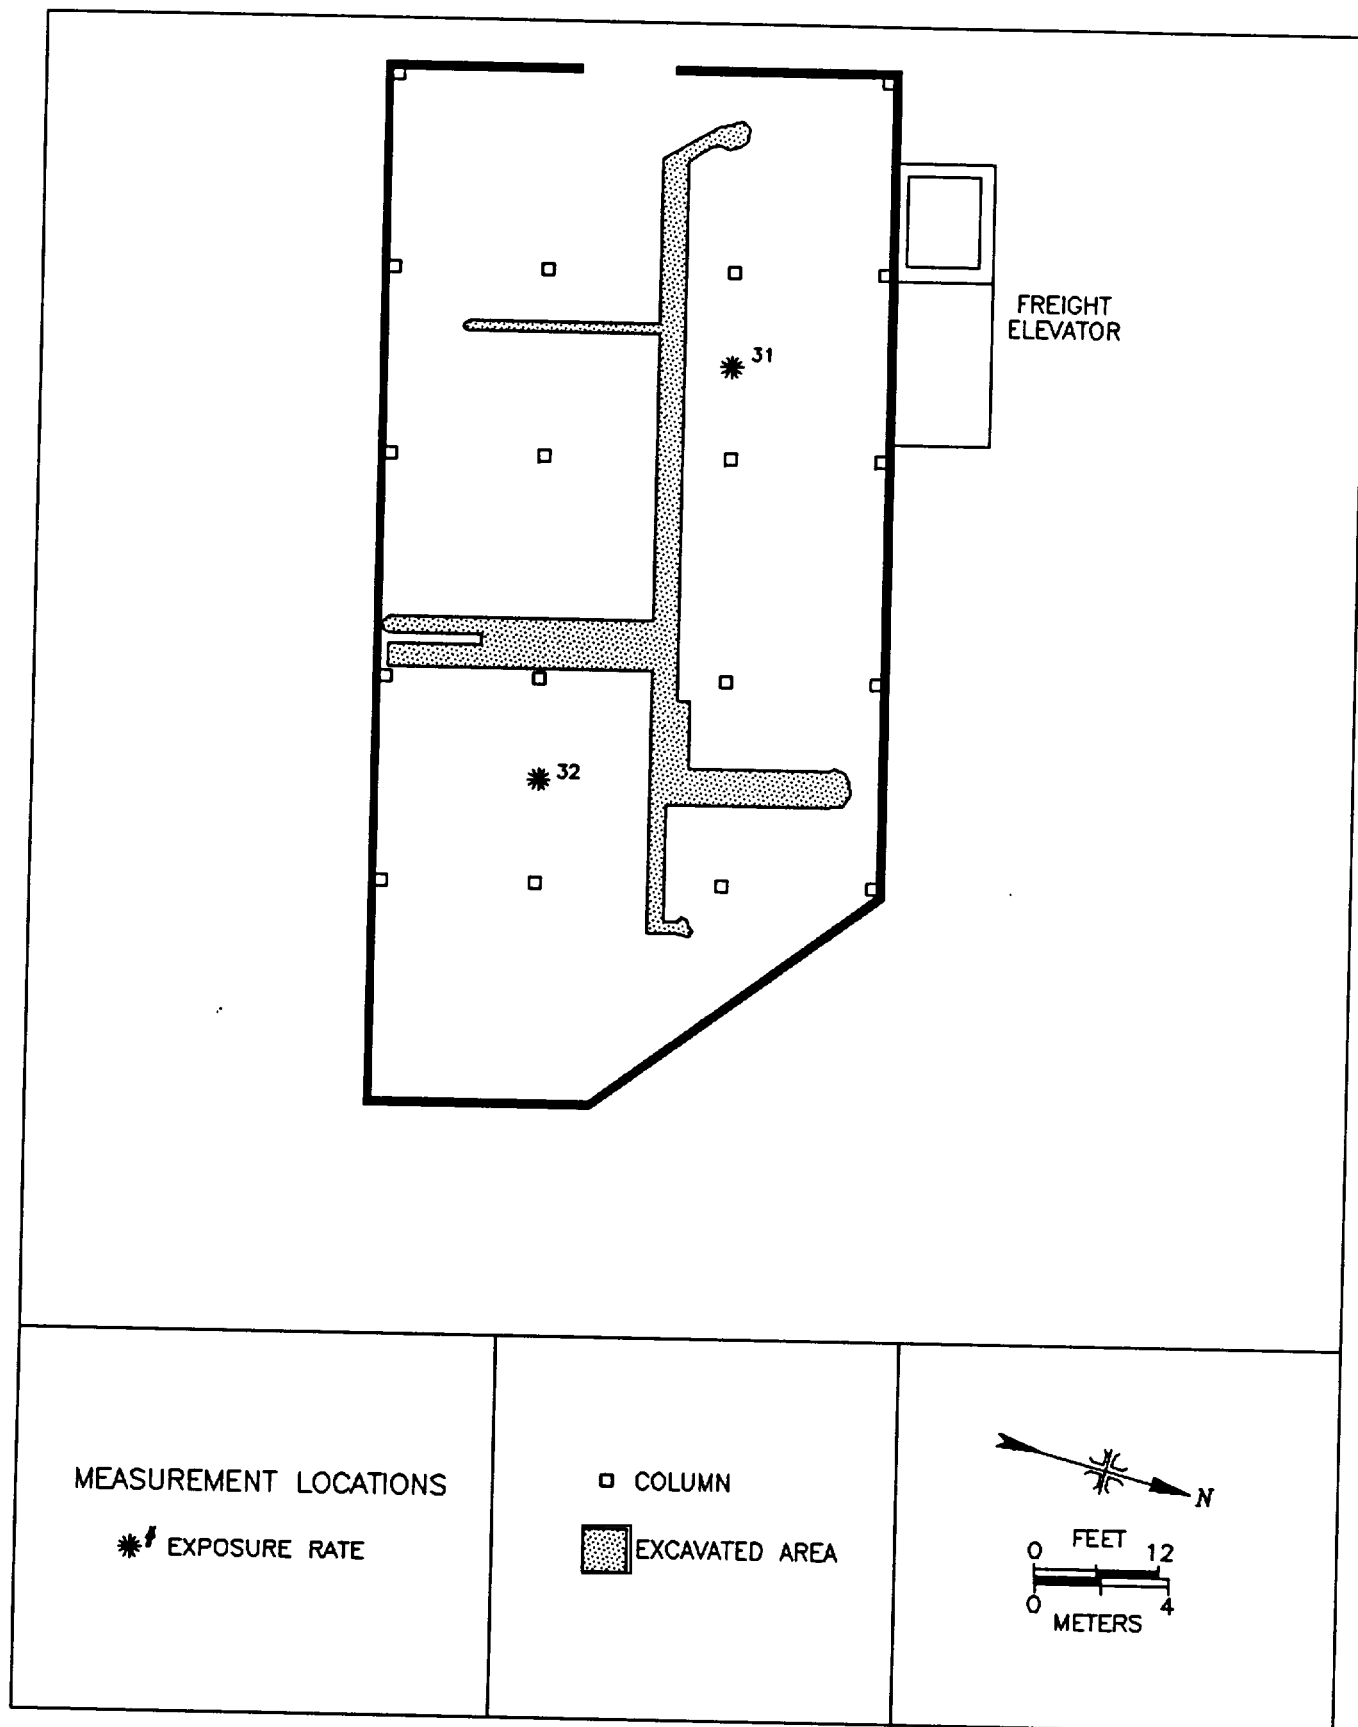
Building 7, Basement – Exposure Rate Measurement Locations
